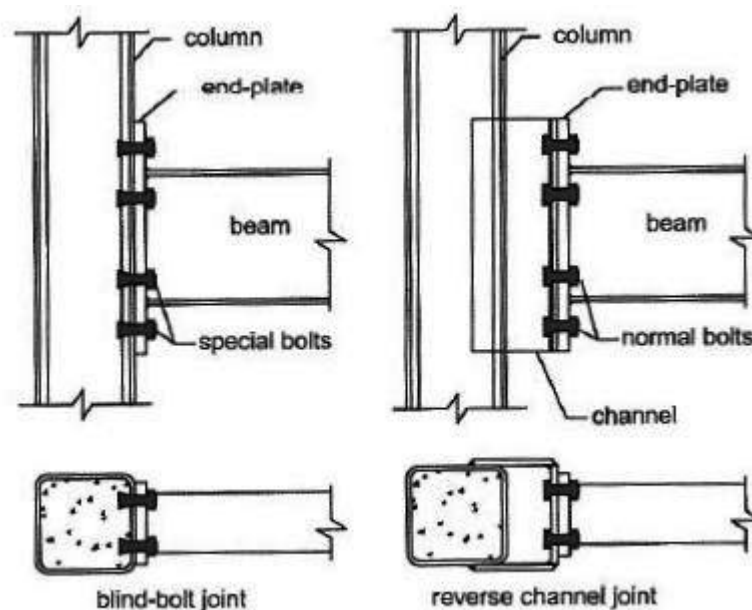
Most common solutions for beam-to-hollow section column joints.
